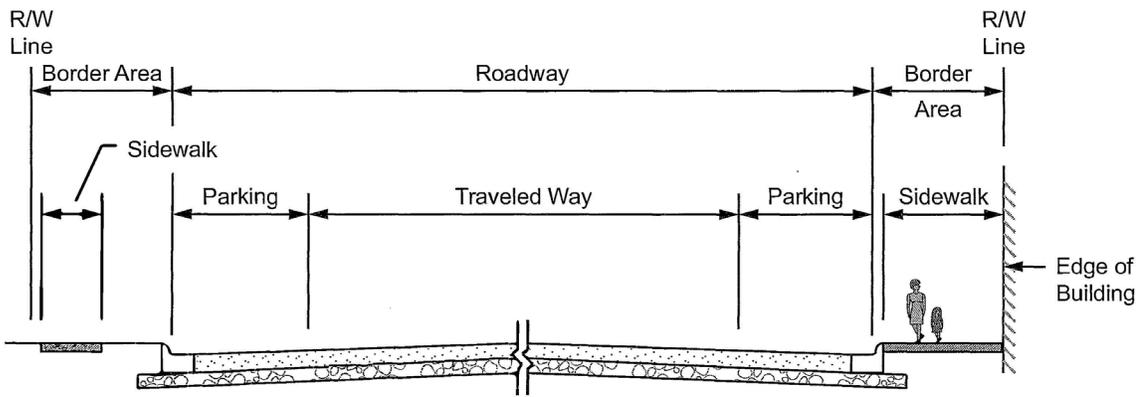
Urban Area with On-Street Parking and Sidewalks
